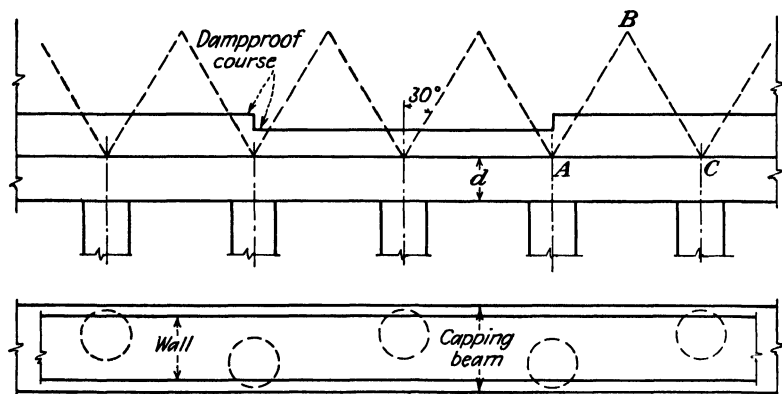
Sketch illustrating discussion of the design of a pile-capping beam and of the measures to ensure proper interaction between the capping beam and the wall above it.
